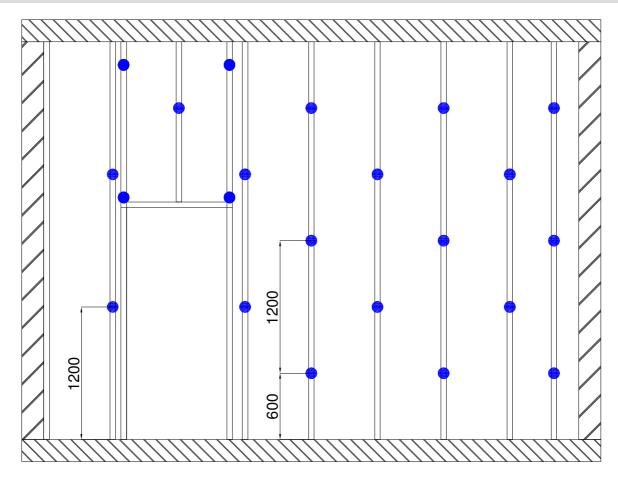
Gypframe 99FC50 Fixing Channel cross brace layout for twin frame partition.
